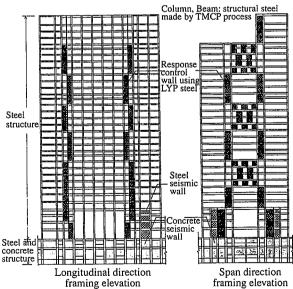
Application cases of LYP steel response control wall (Saitama Wide-area Joint Agency Buildings)
